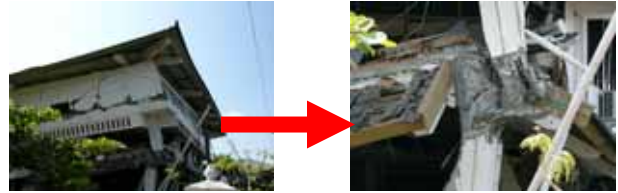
BPKP (Finance and Development Audit Agency) Government building, damaged in the RC beam-column structures where RC columns lap-sliced at joints.
